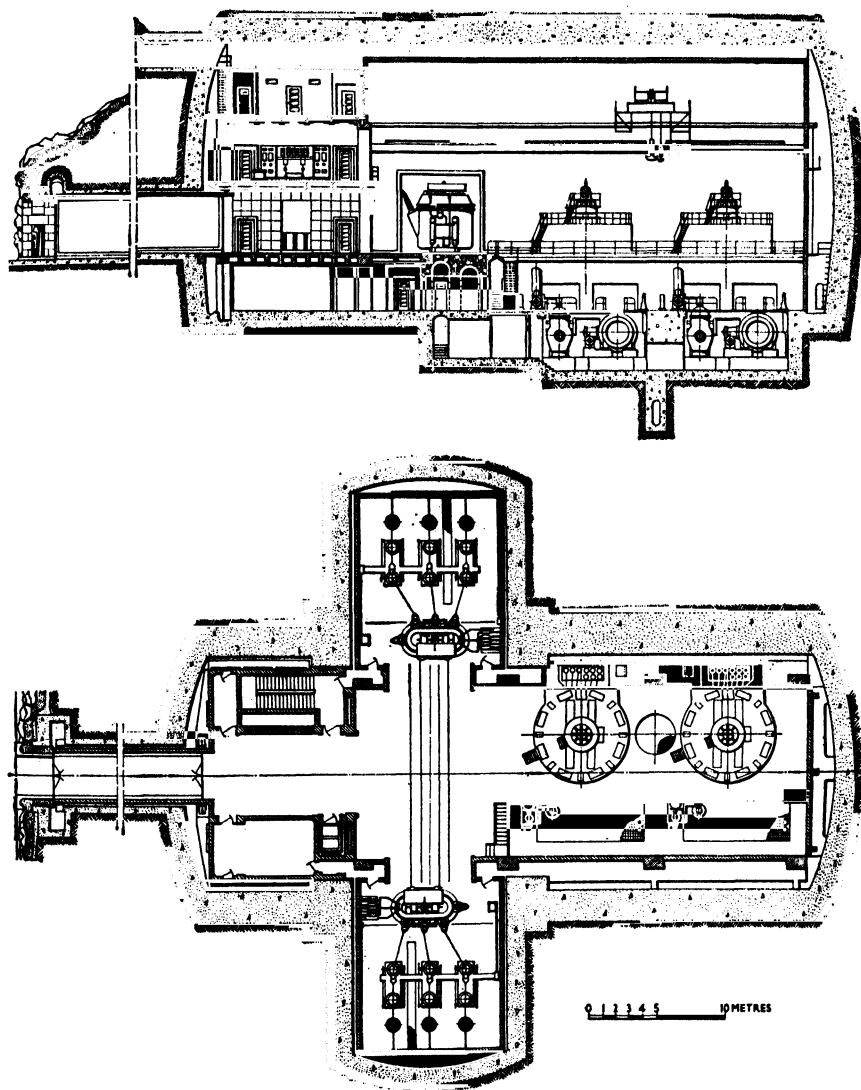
Longitudinal section and sectional plan, Stazzona underground station, Italy.
